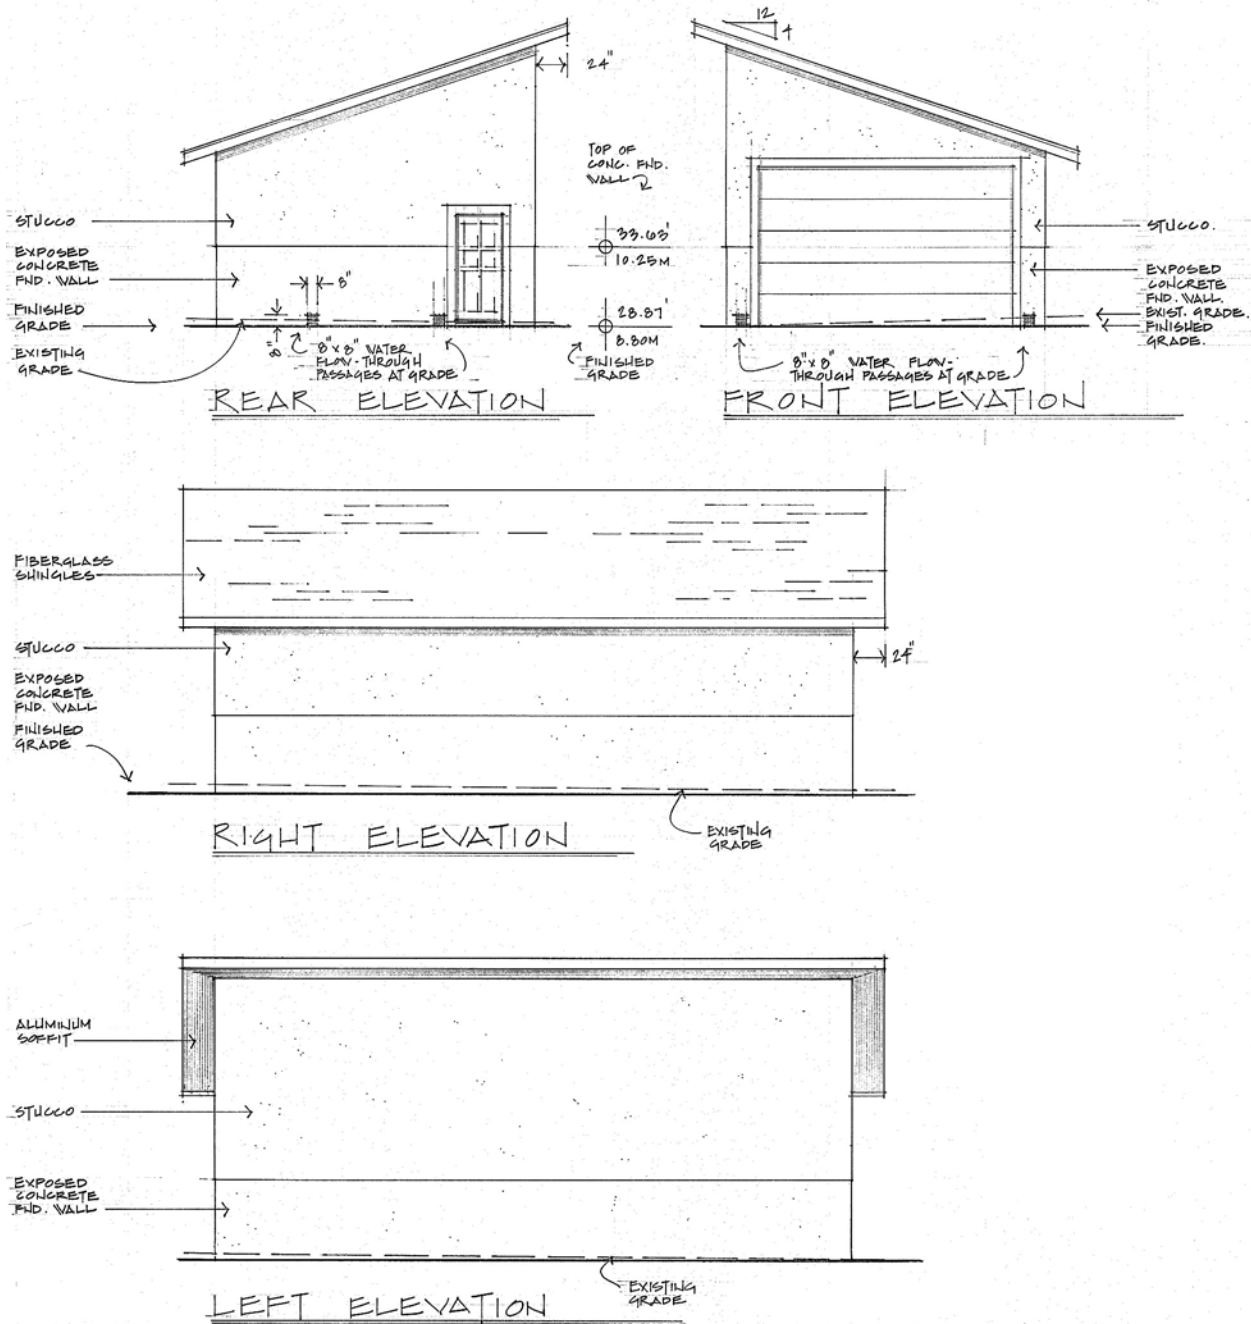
Proposed Elevations (from plans by Deziq Zone)
